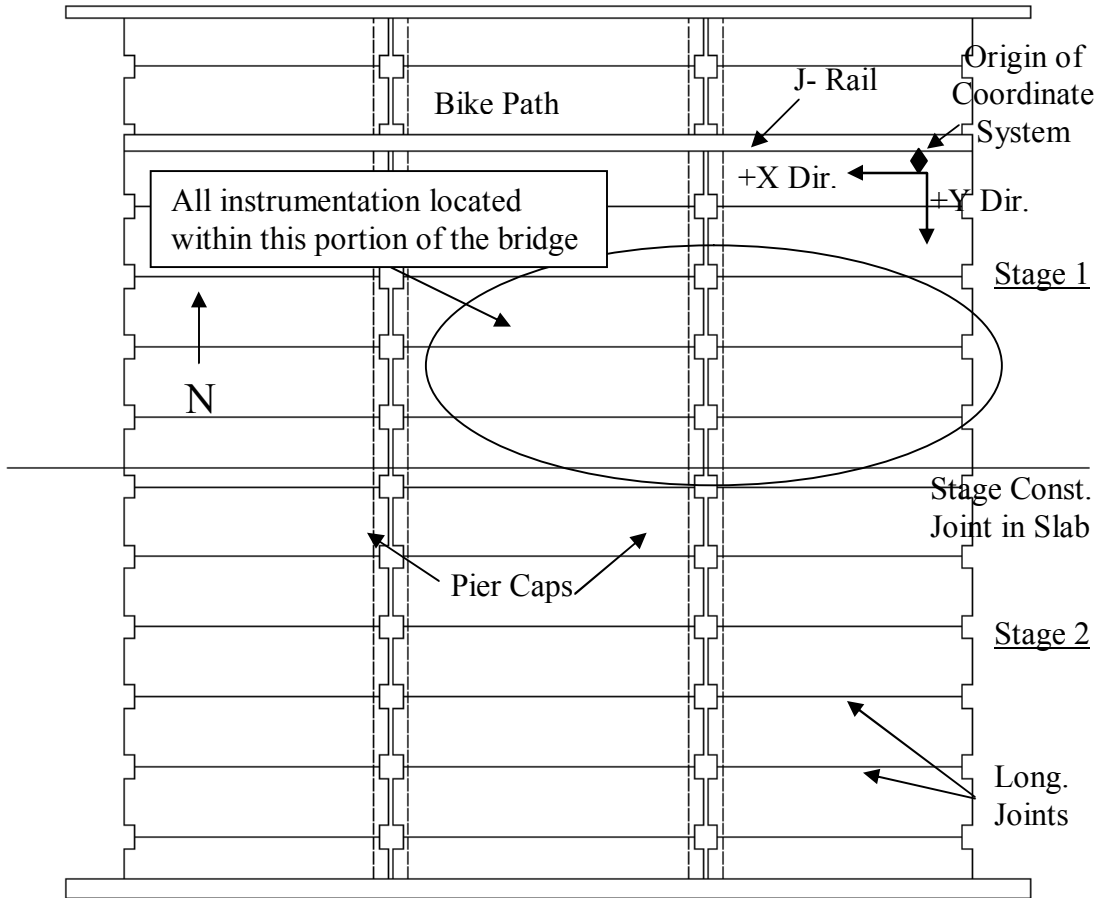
Plan view of Mn/DOT Bridge No. 13004 with instrumented portion highlighted
